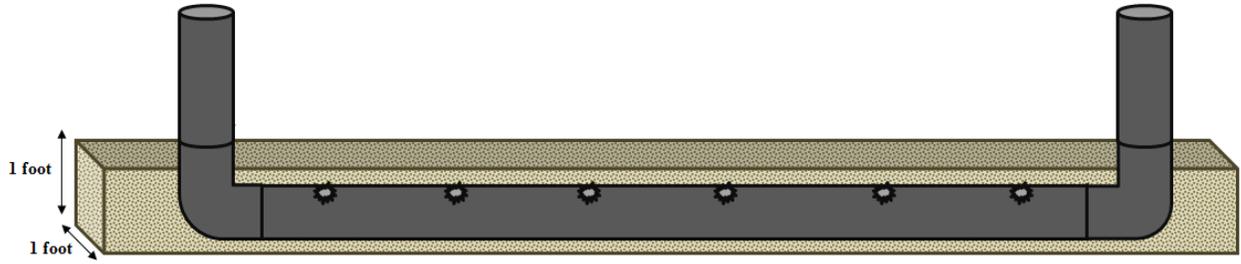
1" Underground Pipeline with 6 Pin-Holes- 12 o'clock Position (3 of these underground pipelines were built for the 1/4", 1/8" and 1/16" pin-holes).
